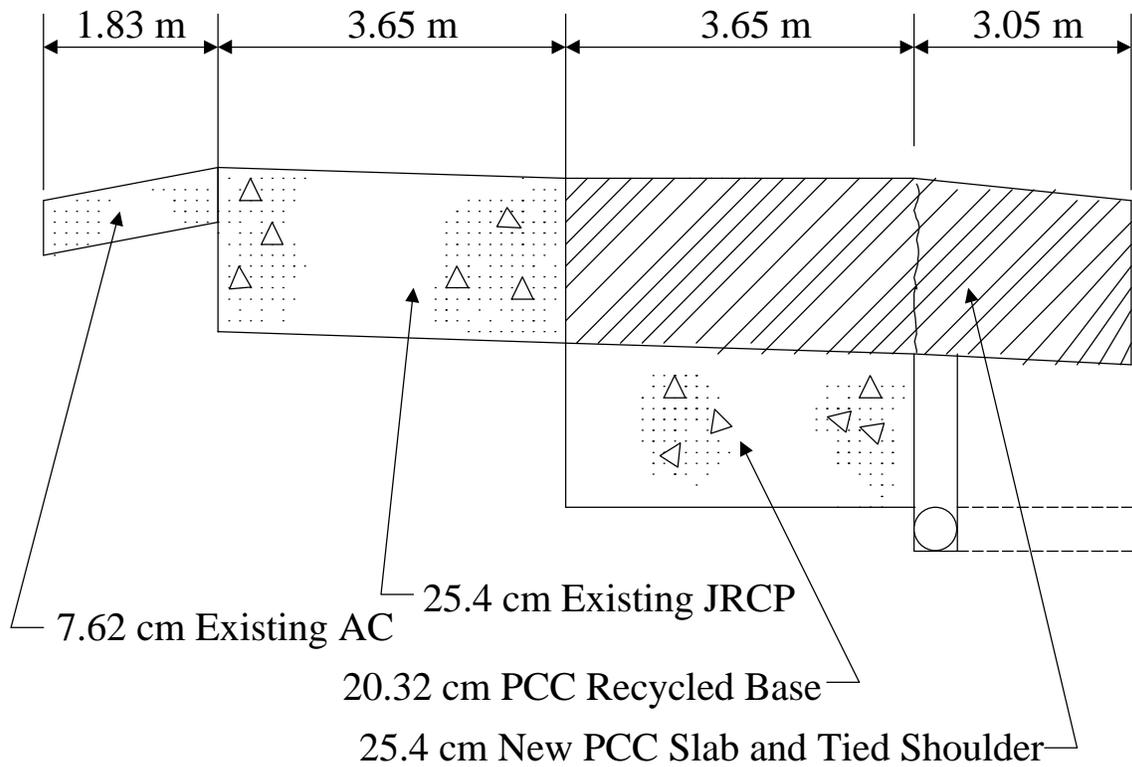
Unbonded concrete resurfacing alternative for example problem 3.
